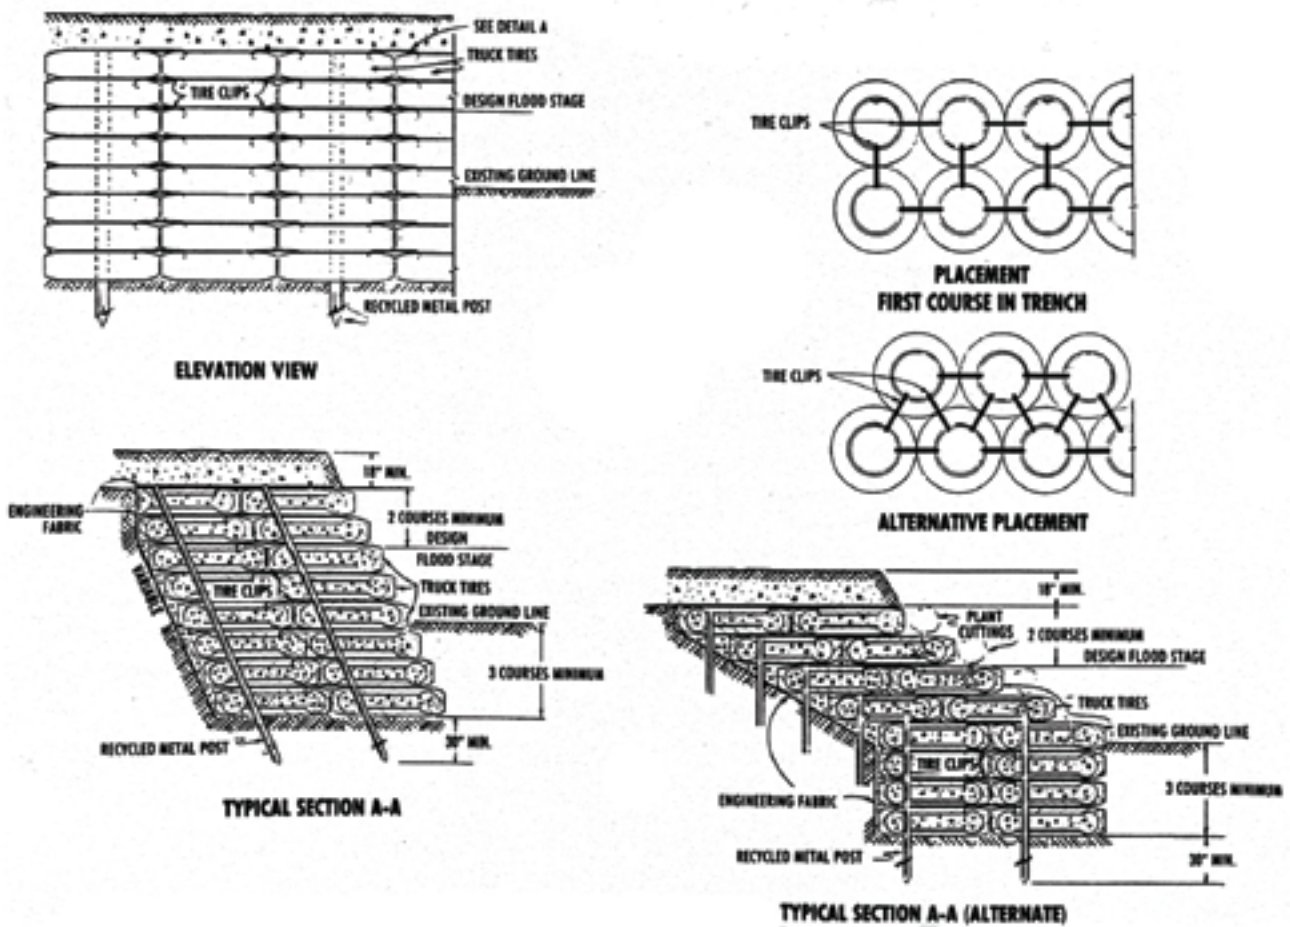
Retaining wall system constructed from whole tires (Ref. 6)
